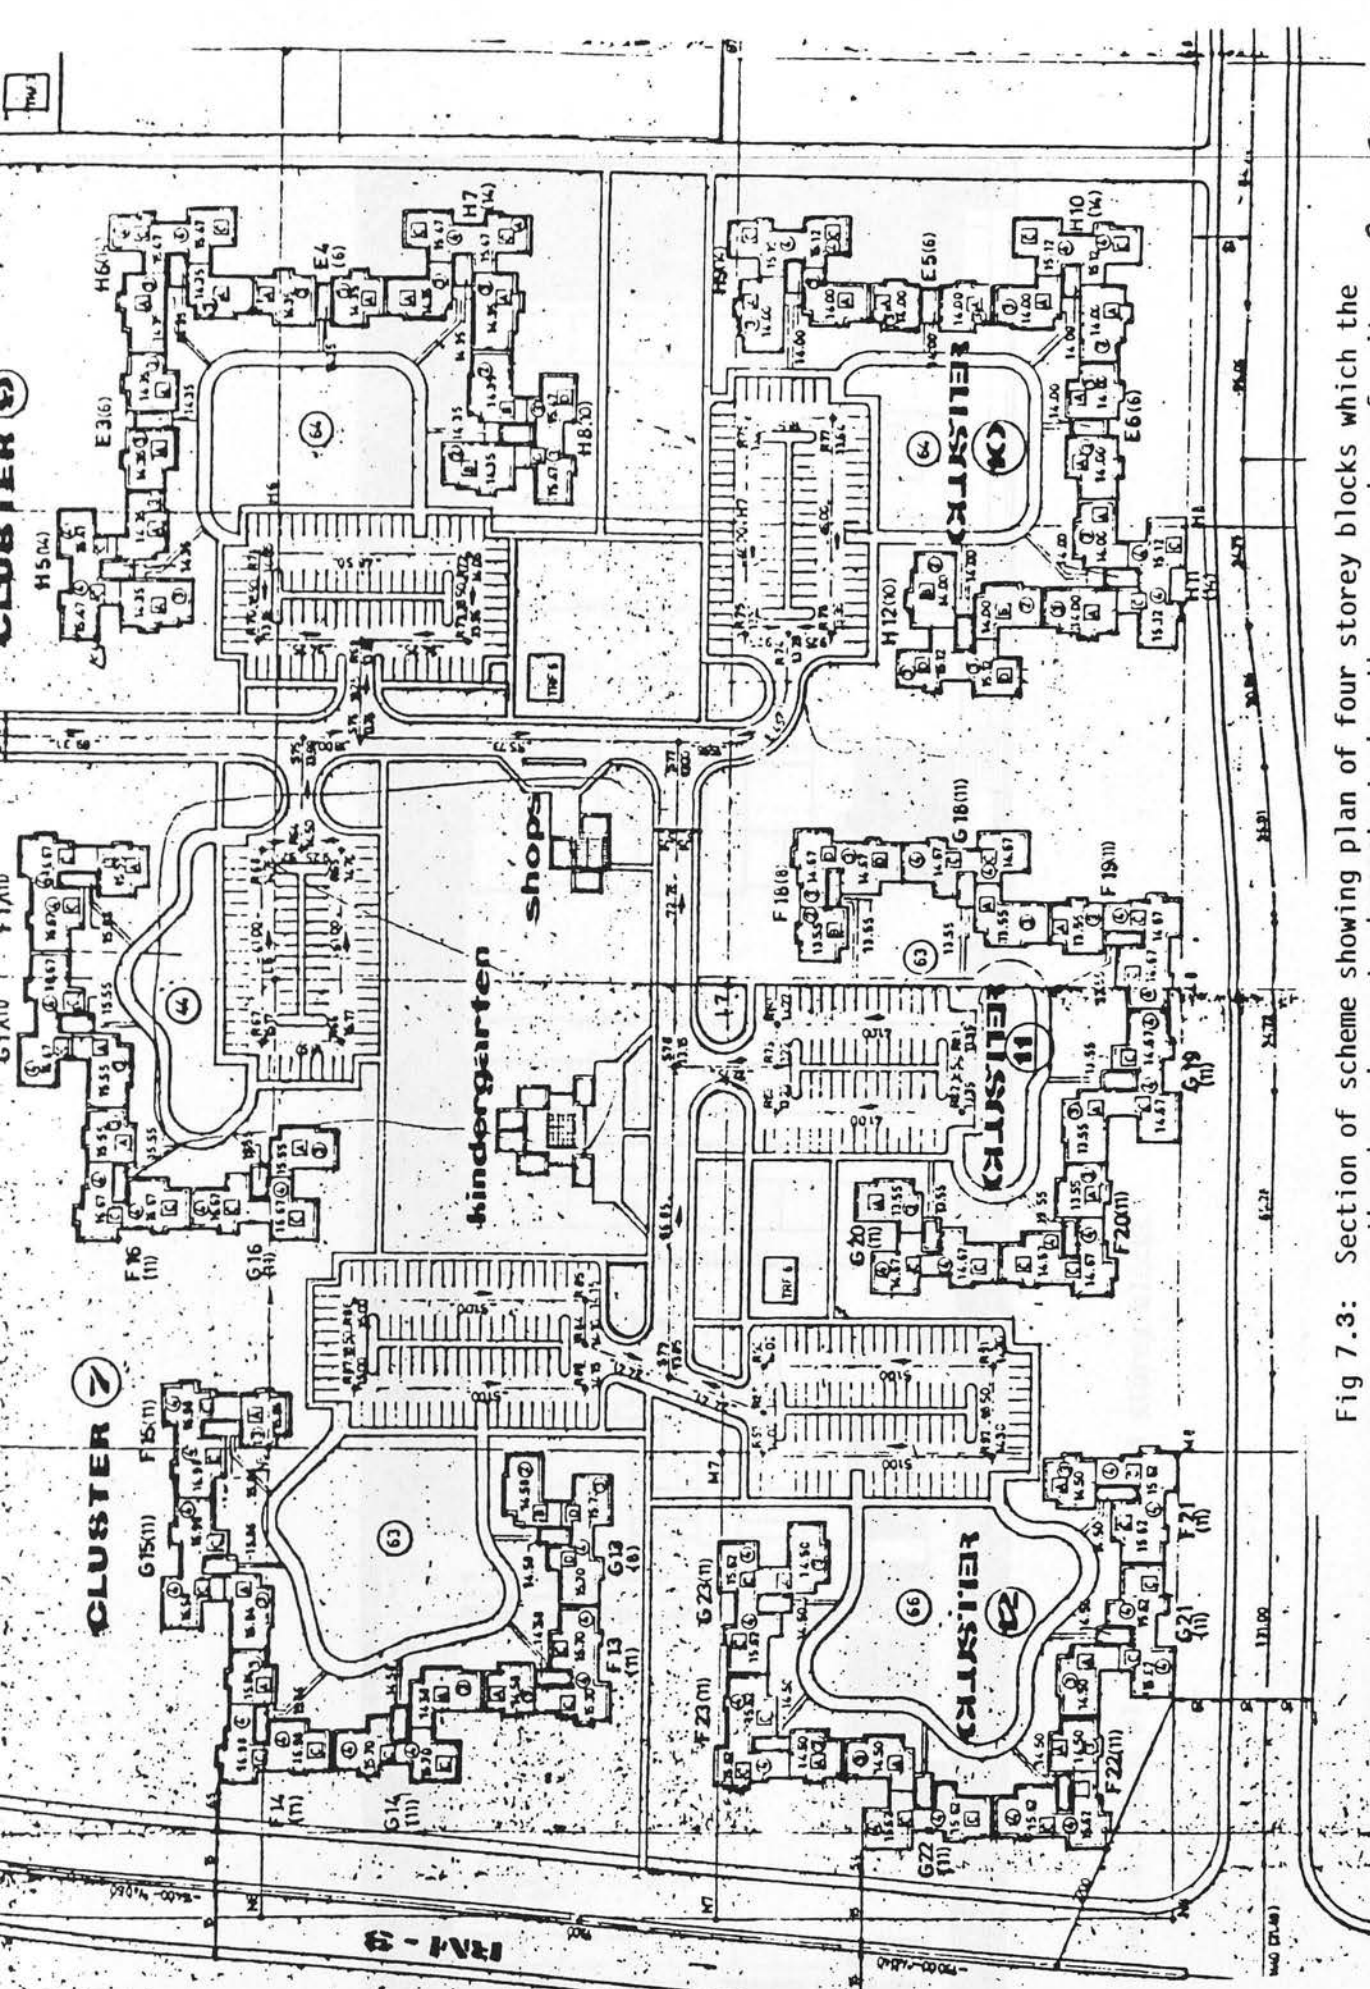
Section of scheme showing plan of four storey blocks which the author has chosen to demonstrate how the same number of units could be provided by using low rise building. See Fig 7.5
